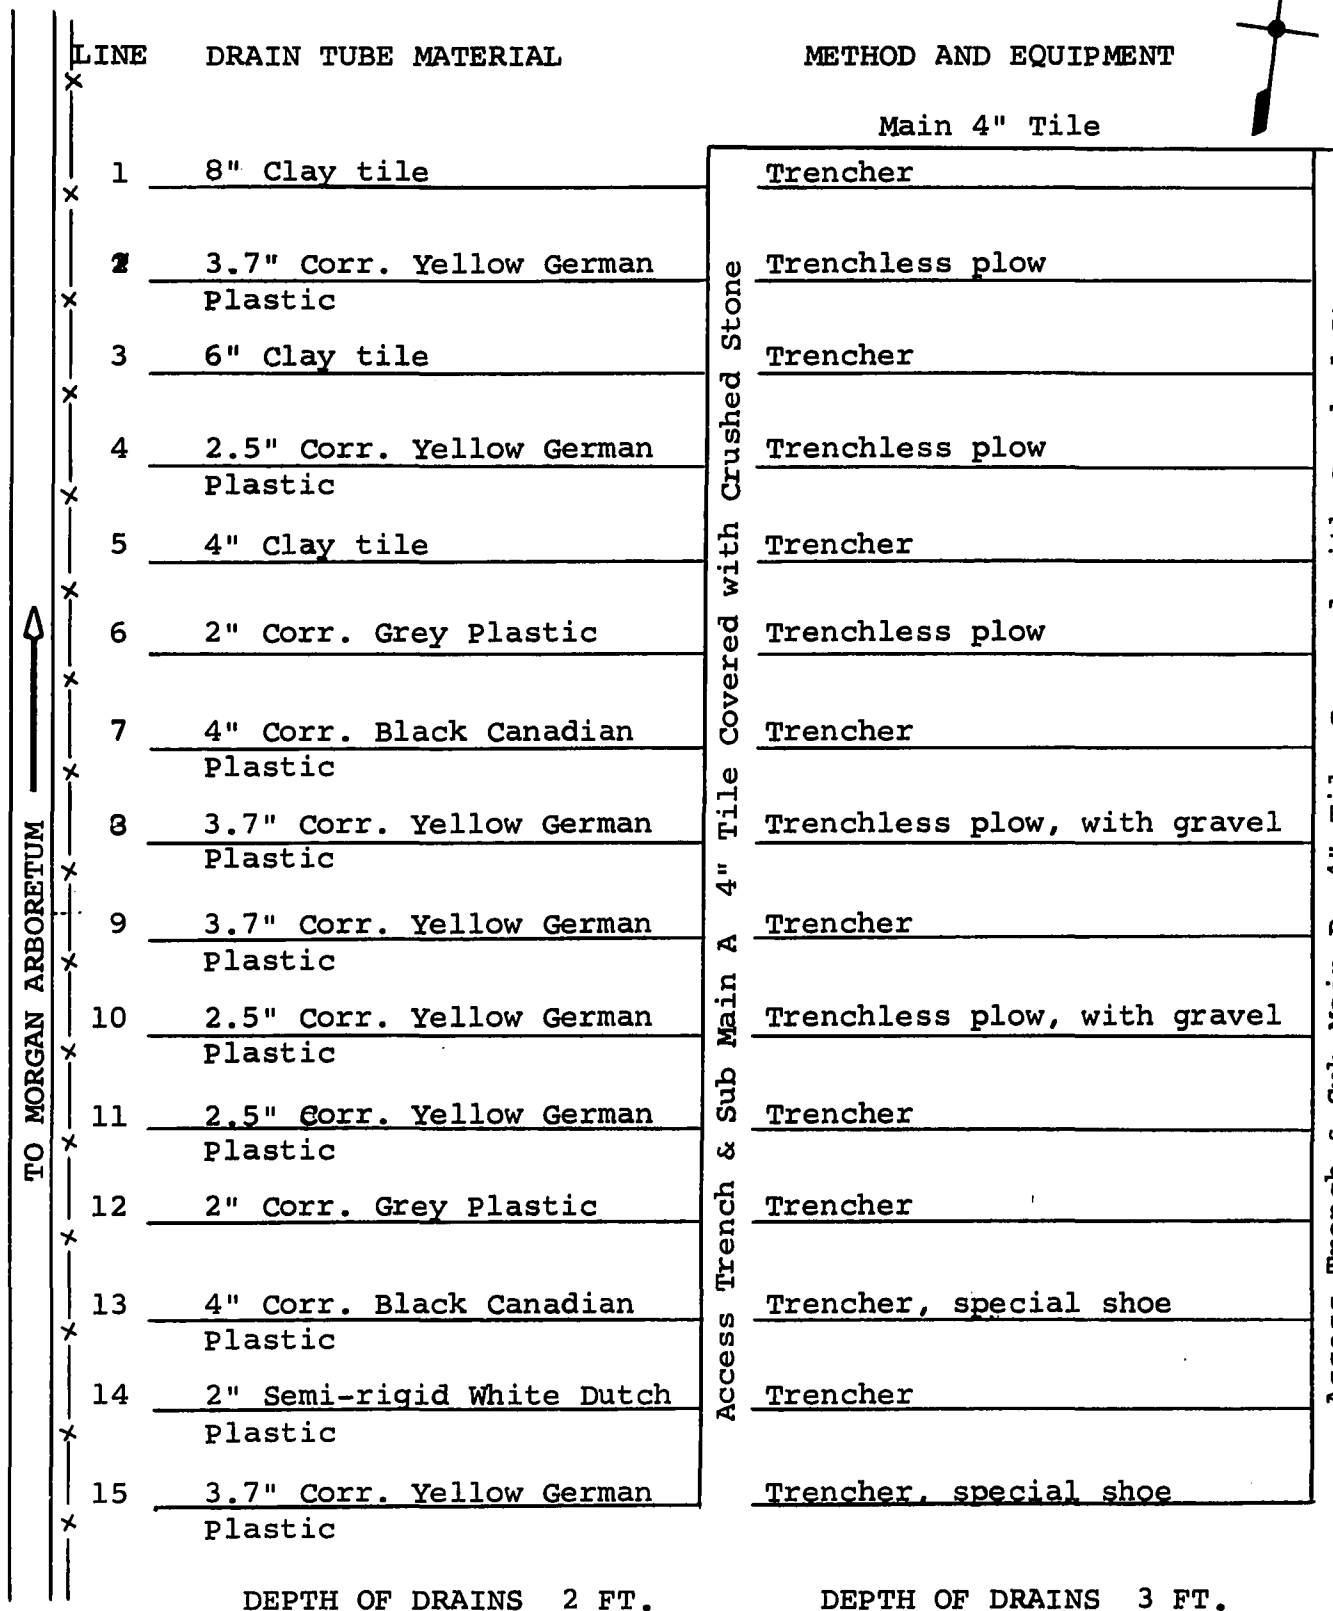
PLAN OF DRAINS FOR LOADING TESTS.
